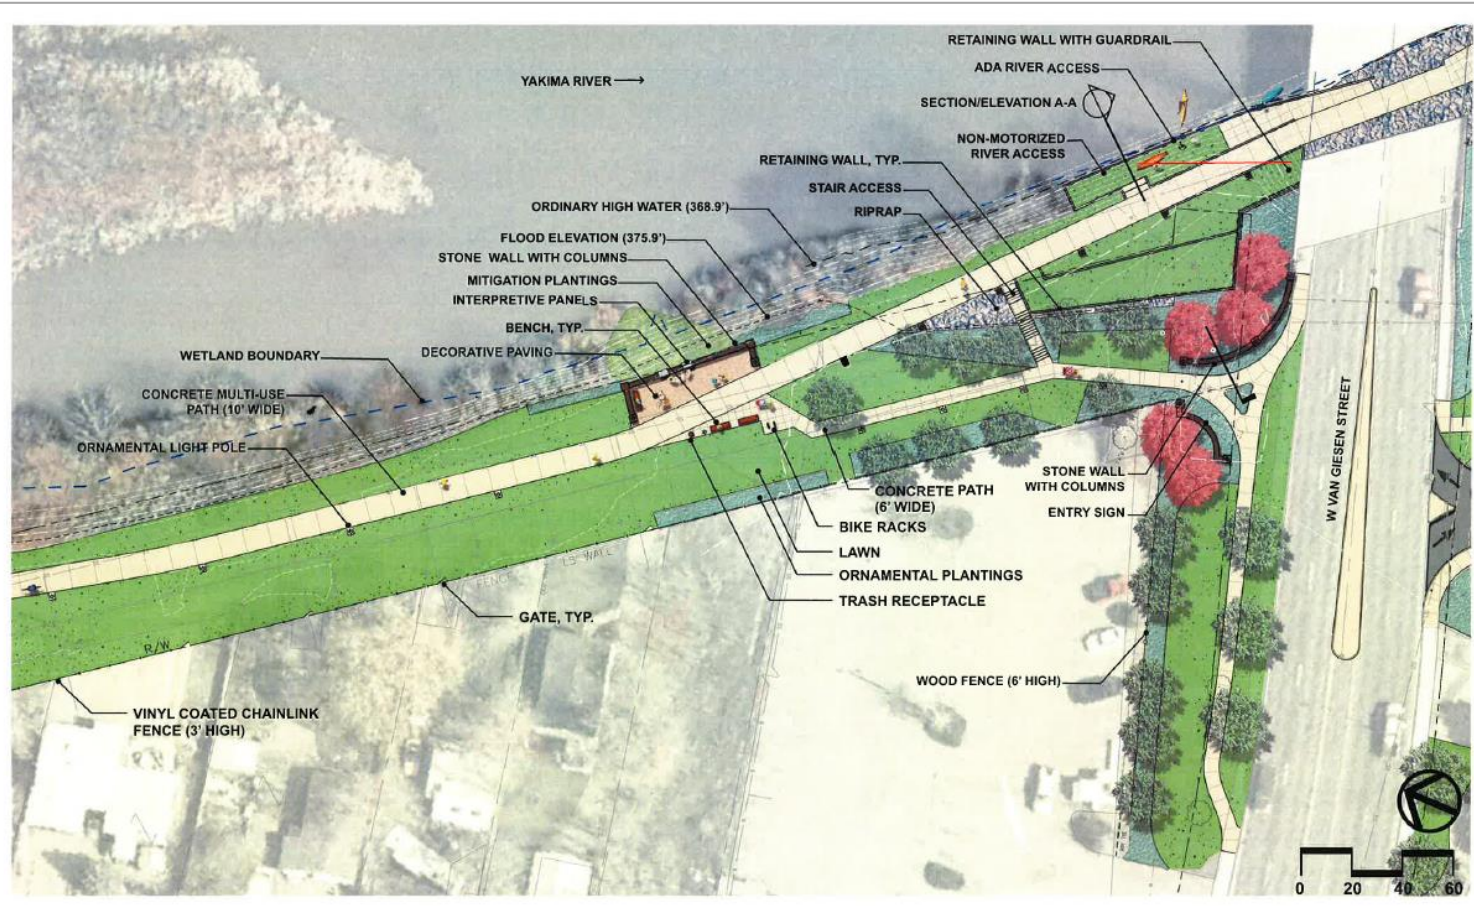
Overlook, Watercraft Access and Trail, North of Van Giesen Street Bridge
